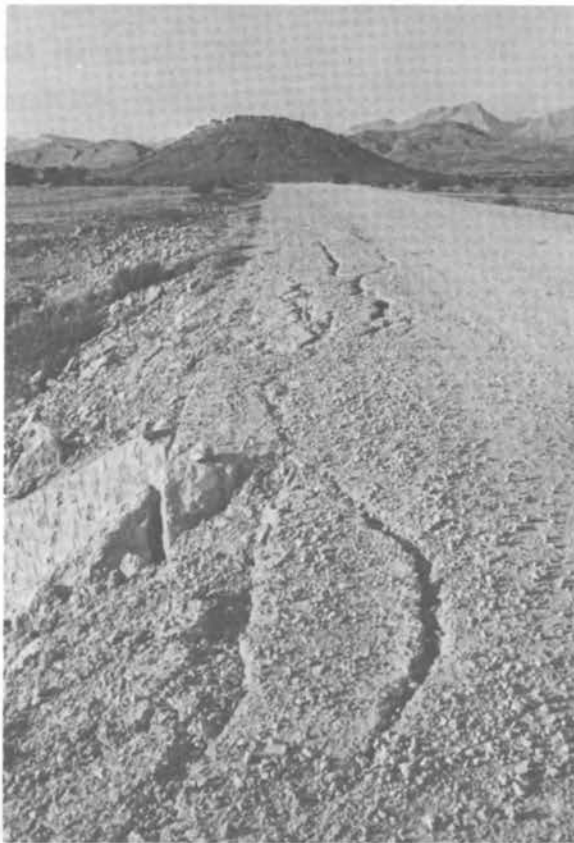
Damage to the Road Embankments Near a Small Culvert.
